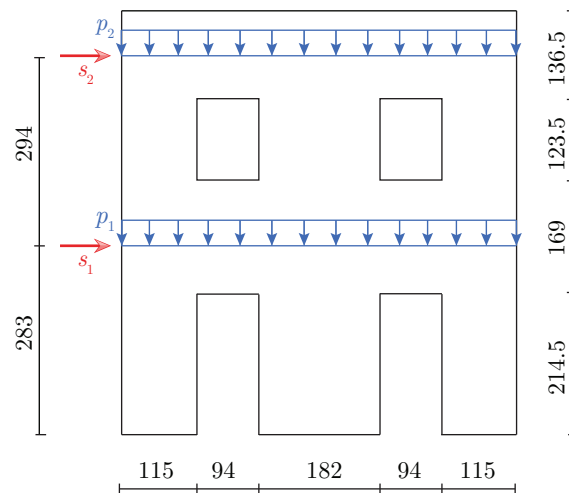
Pavia wall D: geometry and loading conditions (dimension in [cm]).
